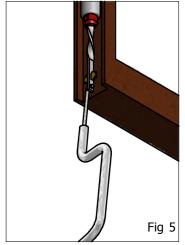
Latch the cross pin into the bracket seat and remove the tension tool. Finally check for a smooth operation of the sash.
